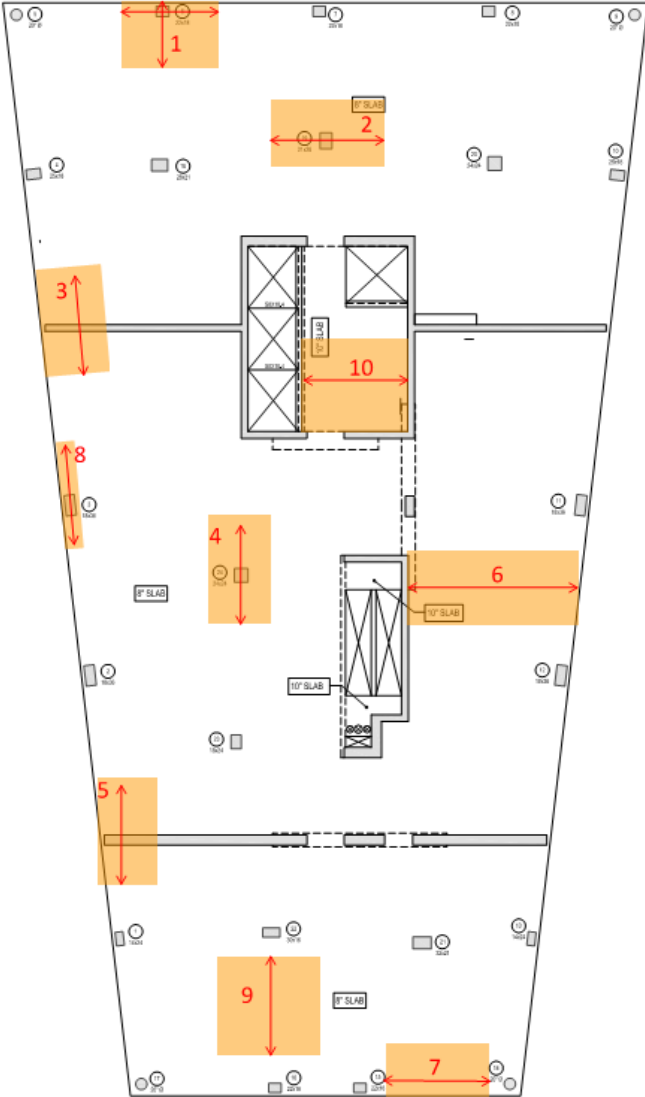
Location of Slab Reinforcement Checks (from S-320.00)
